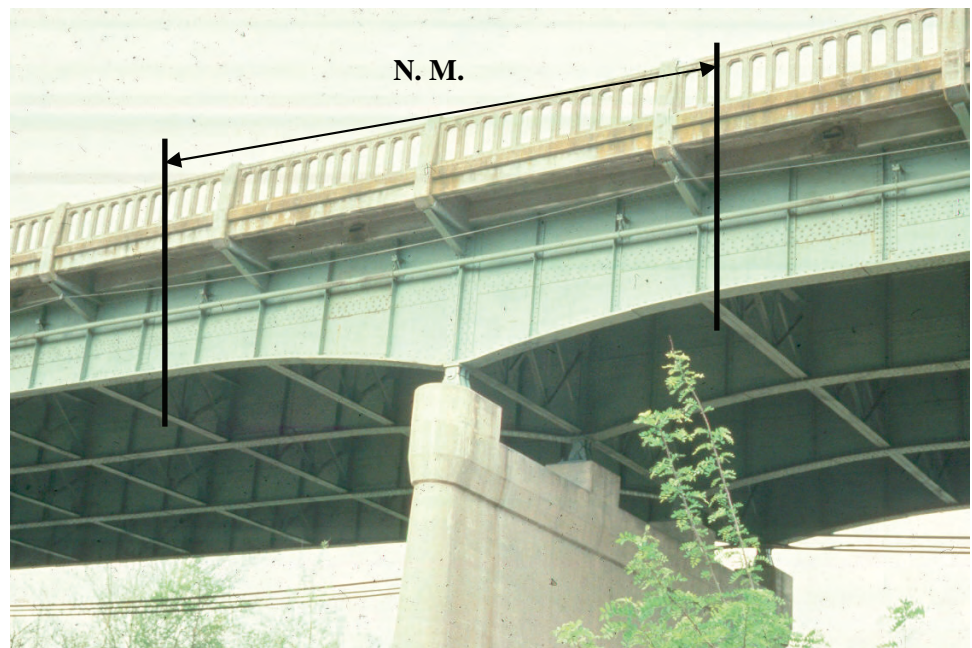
Flexural Zone on a Fabricated Multi-girder Bridge
